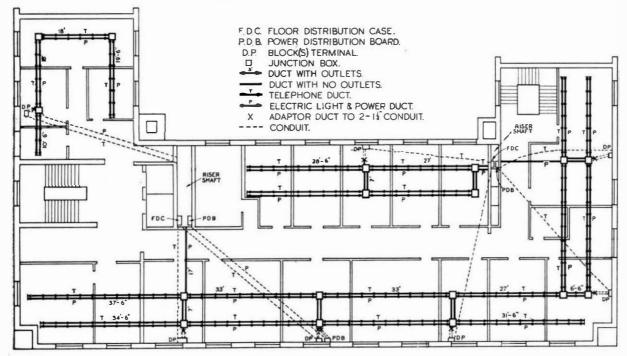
TYPICAL UNDER-FLOOR DUCTS LAYOUT IN A MODERN OFFICE.
